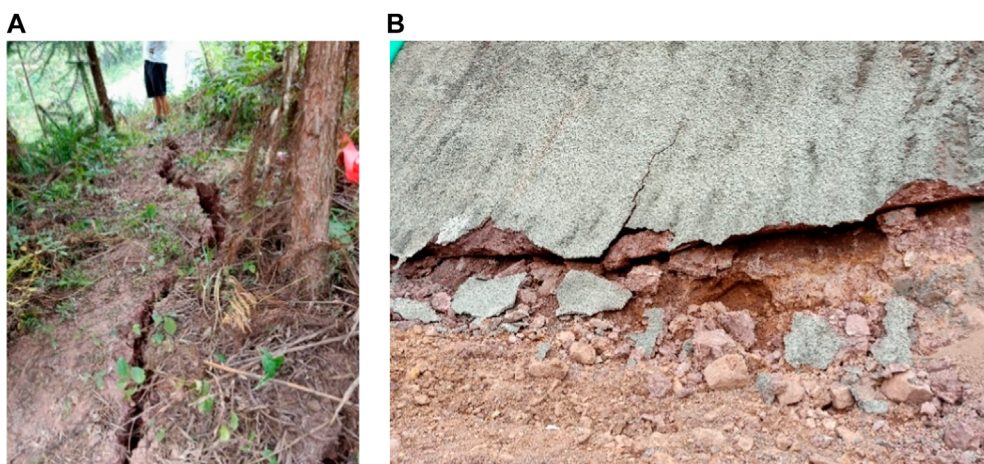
Evidence of deformation of cut slope. (A): A tension crack in the crown, (B): A shearing outlet at the toe.
